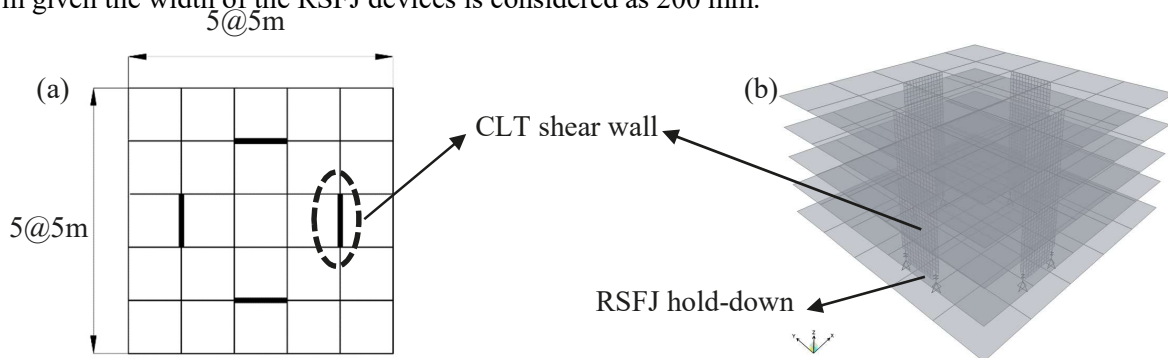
Numerical model of the structure: (a) plan view of the structure, (b) general arrangement
